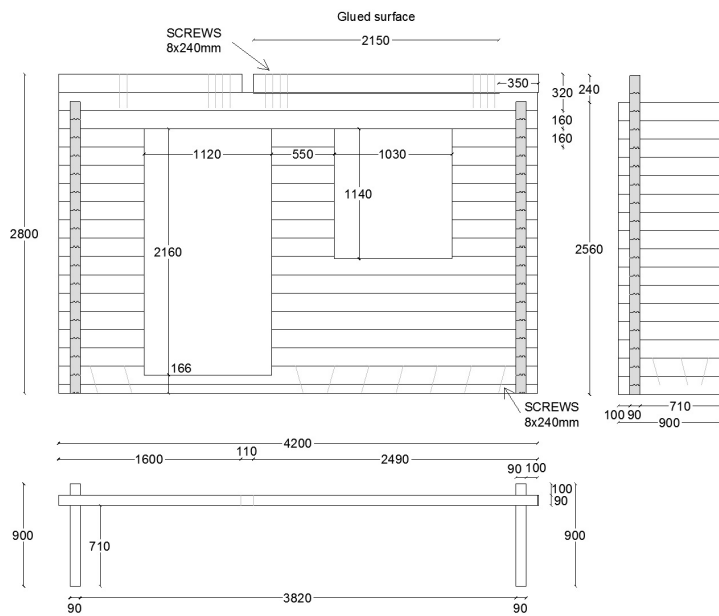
Dimension of M/C_ST_OP wall specimen.
